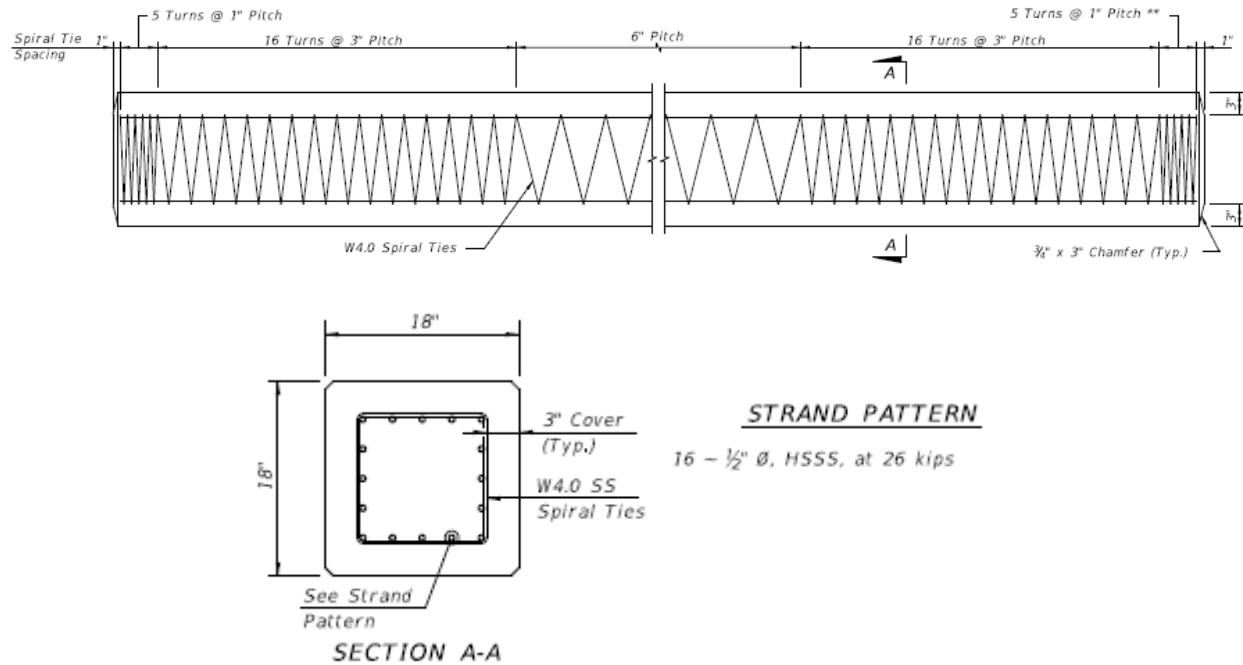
Details of prestressed concrete pile using HSSS strands and SS ties (FDOT Standard Drawings Index Series 455, 2018)
